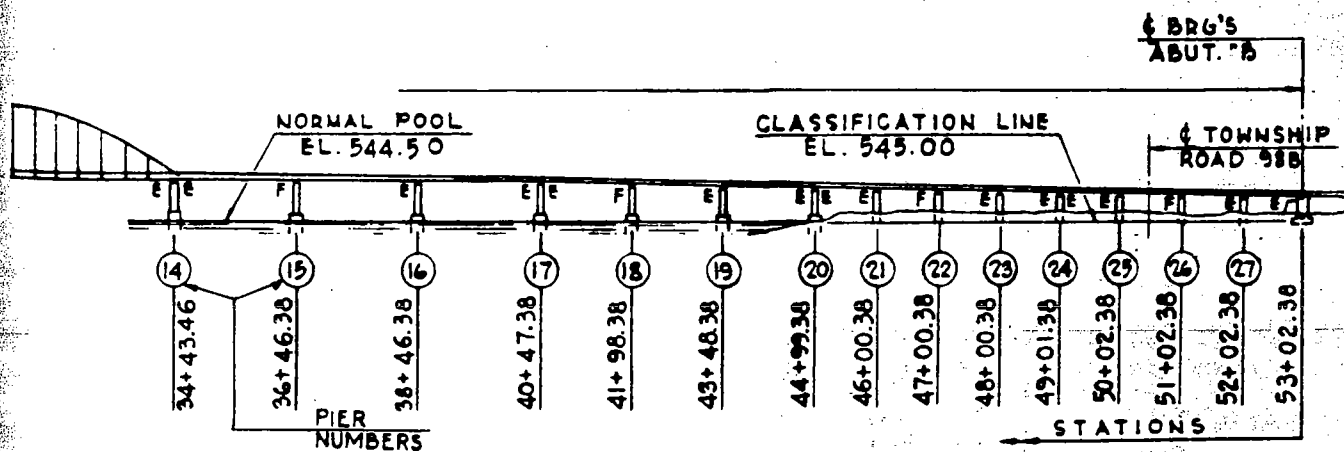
BRIDGE ELEVATION AND BORING LOCATION PLAN.
